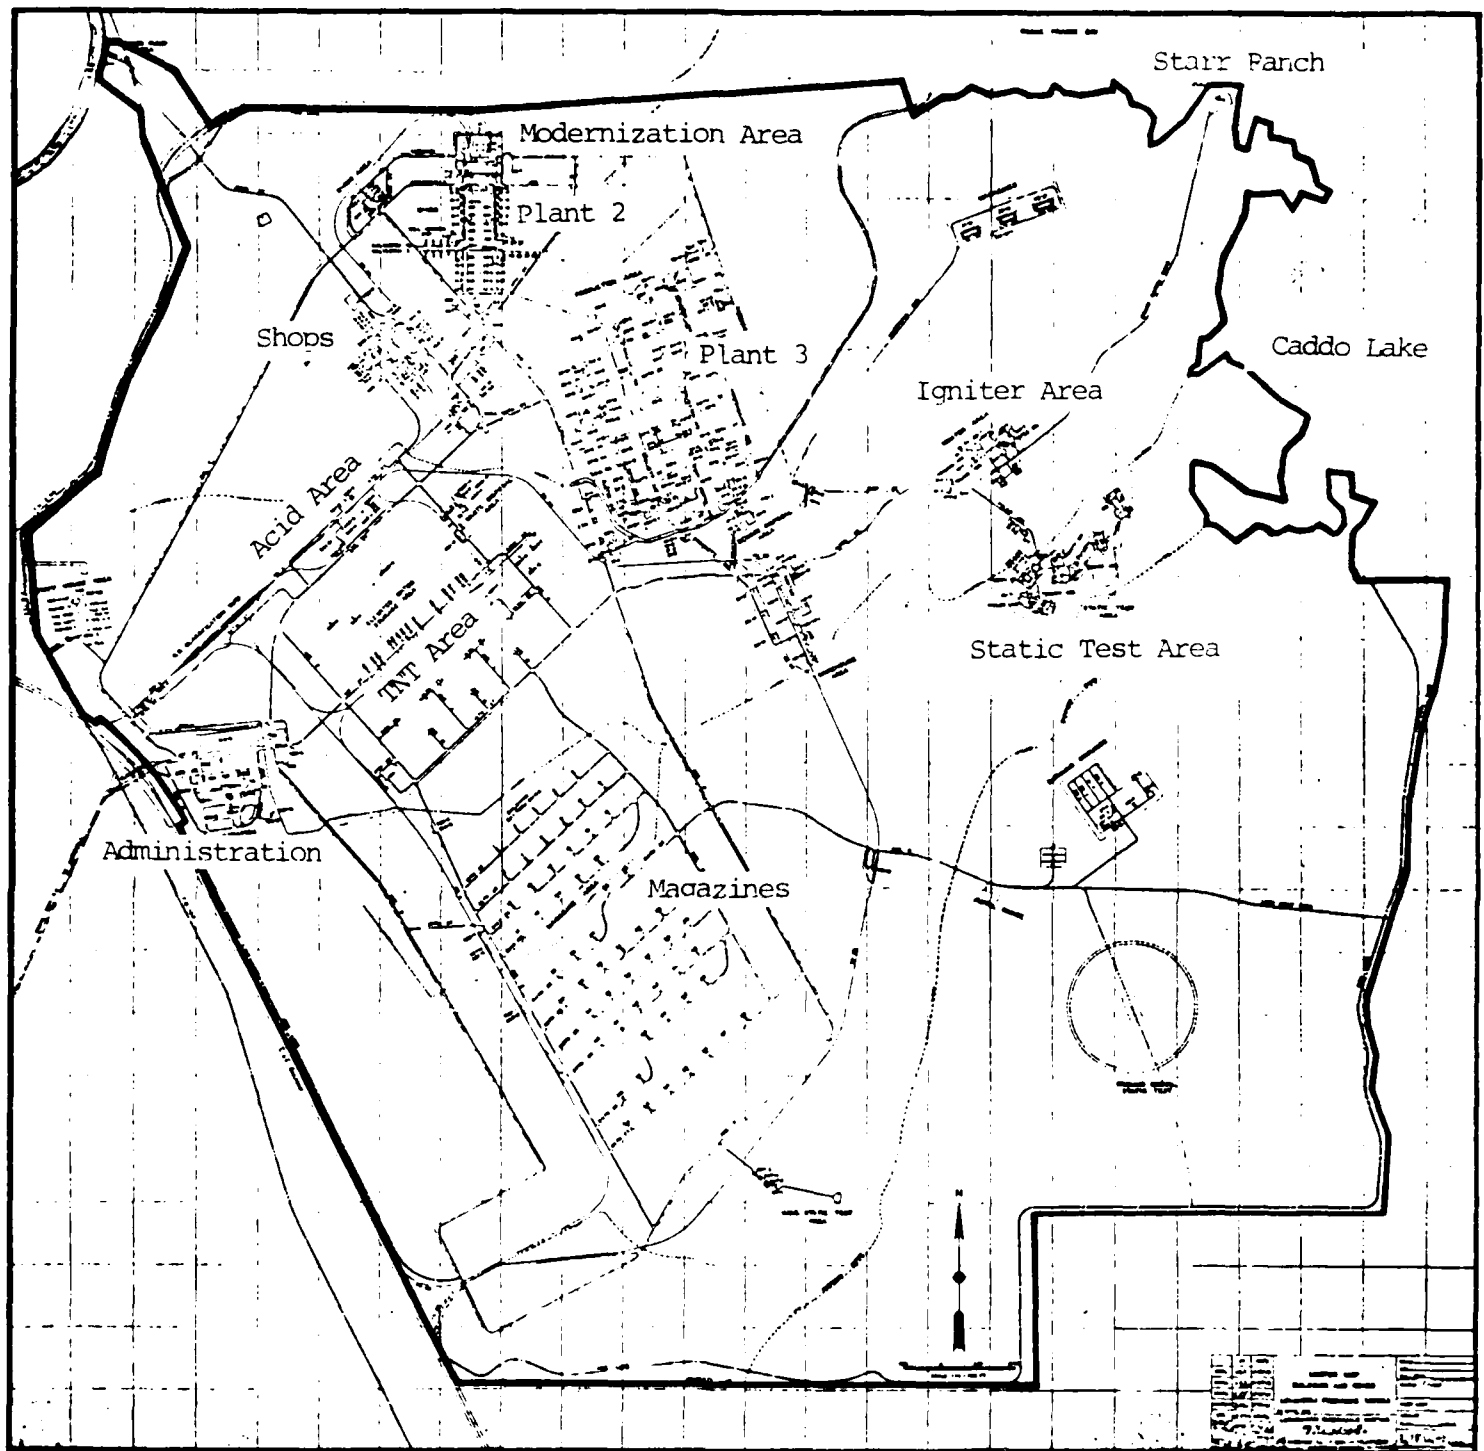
LHAAP. Site plan, 1961. (Source: Thiokol Corporation files, LHAAP.)
